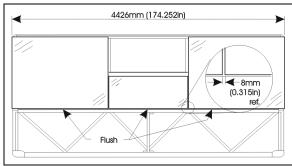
FACE FIXED WINDOW INSTALLATION
